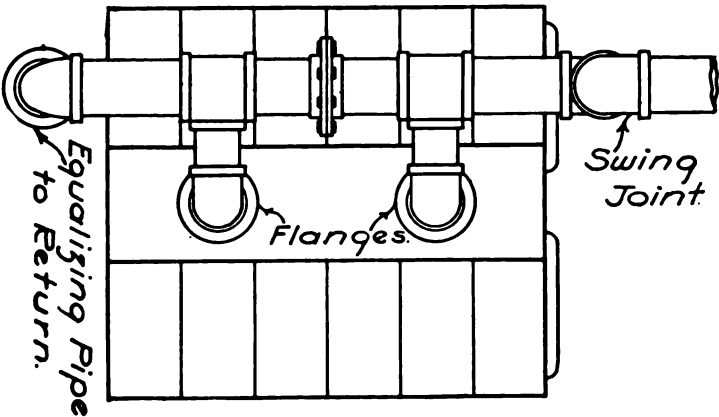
Showing Steam Header on Boiler.—Plan.
